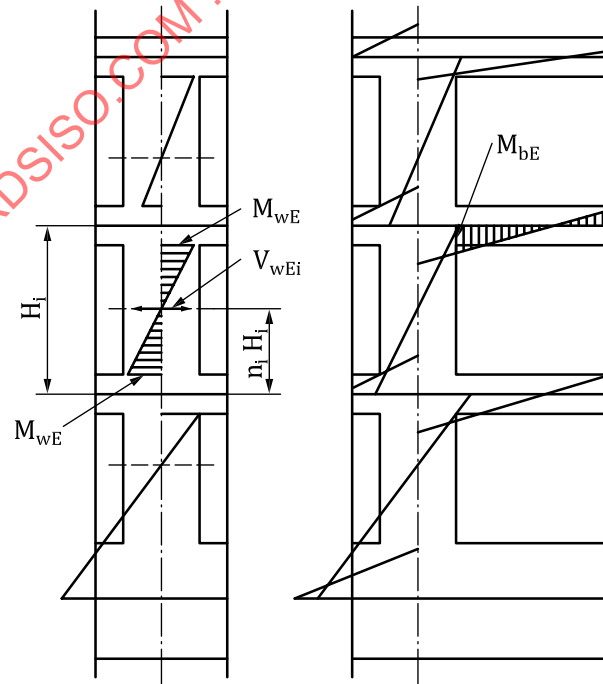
Shear force V_{wEi} , moment M_{wE} in structural wall and moment M_{bE} in wall girder
